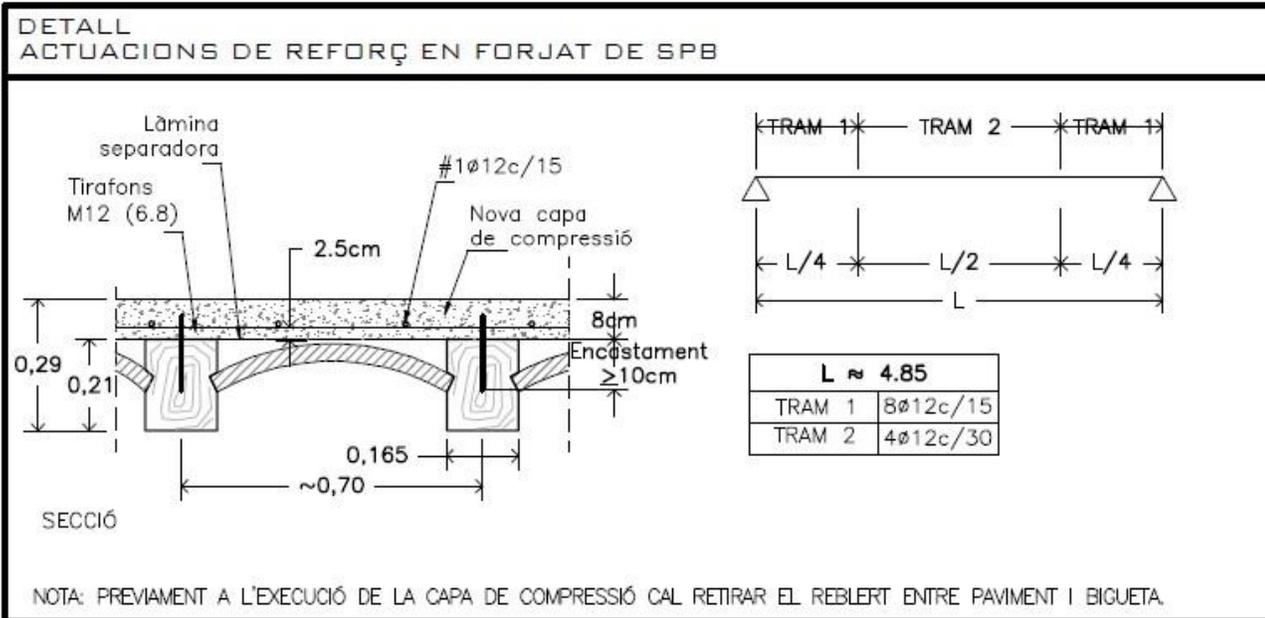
Detailed example of rehabilitation using a fire-resistant reinforced concrete compression layer of an existing 4.85 m span slab of wood joists and ceramic vaults. In this case, the new concrete layer is resolved with a thickness of 8cm and only a bottom reinforcement of #1Ø12c/15. This compression layer will work as a bidirectional slab in a fire situation and will be resistant on its own without the wood joists (which are considered to be carbonized). © *bisstructures
